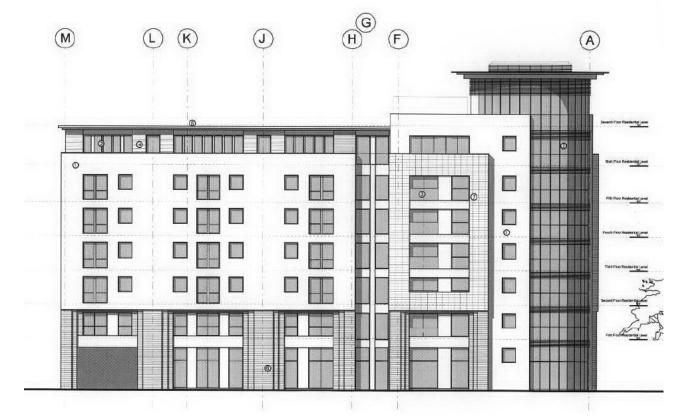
Approved St. Albans Road elevation for planning application 07/00498/FULM.
